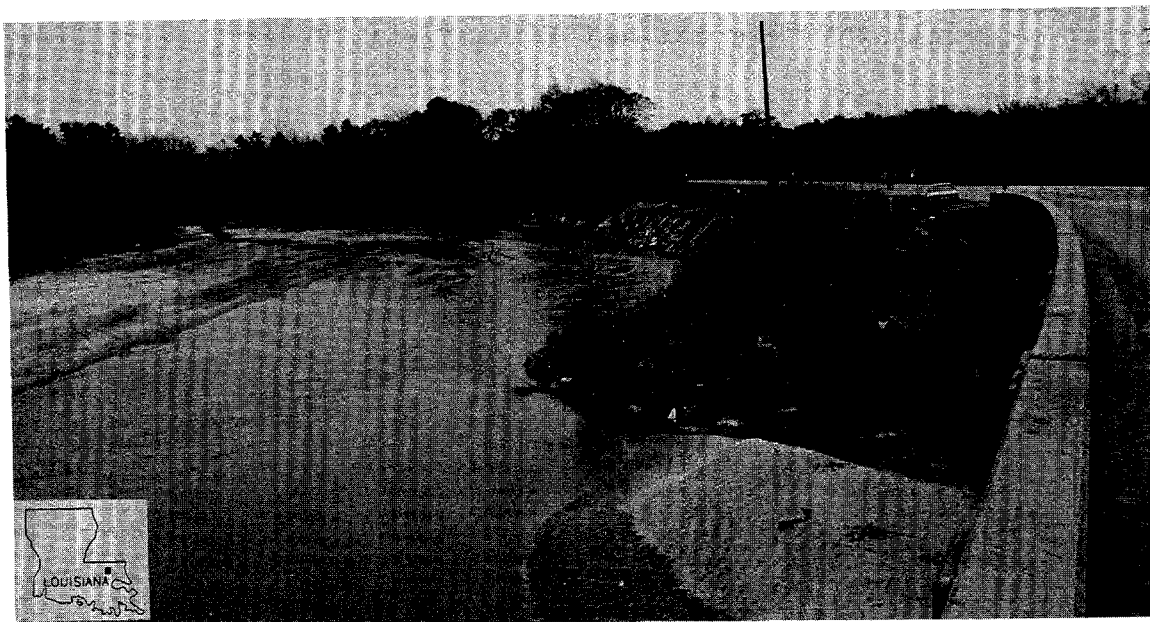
View on March 2, 1977, looking upstream from SR-40 bridge, where stream flows along approach embankment before turning to enter bridge waterway.
